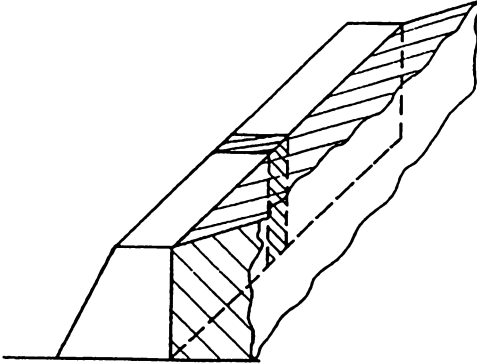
Retaining wall showing a plate slice as an example of plane strain conditions.
